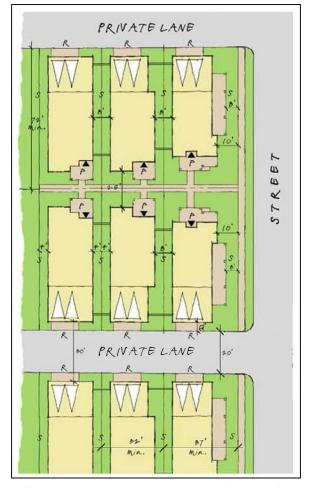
B: Example of a Small Lot Single-Family Alley-Loaded Subdivision
